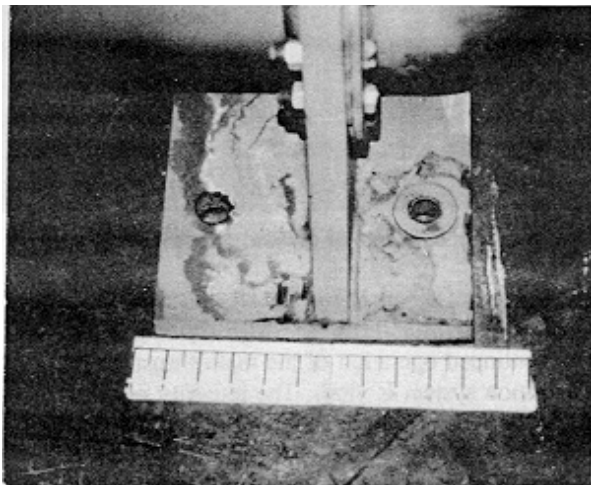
Unanchored chiller. In large facilities, such as a dam, when some equipment was initially installed, modified, or replaced, it may not have been adequately anchored. A walk-through of facilities will usually find unanchored equipment
